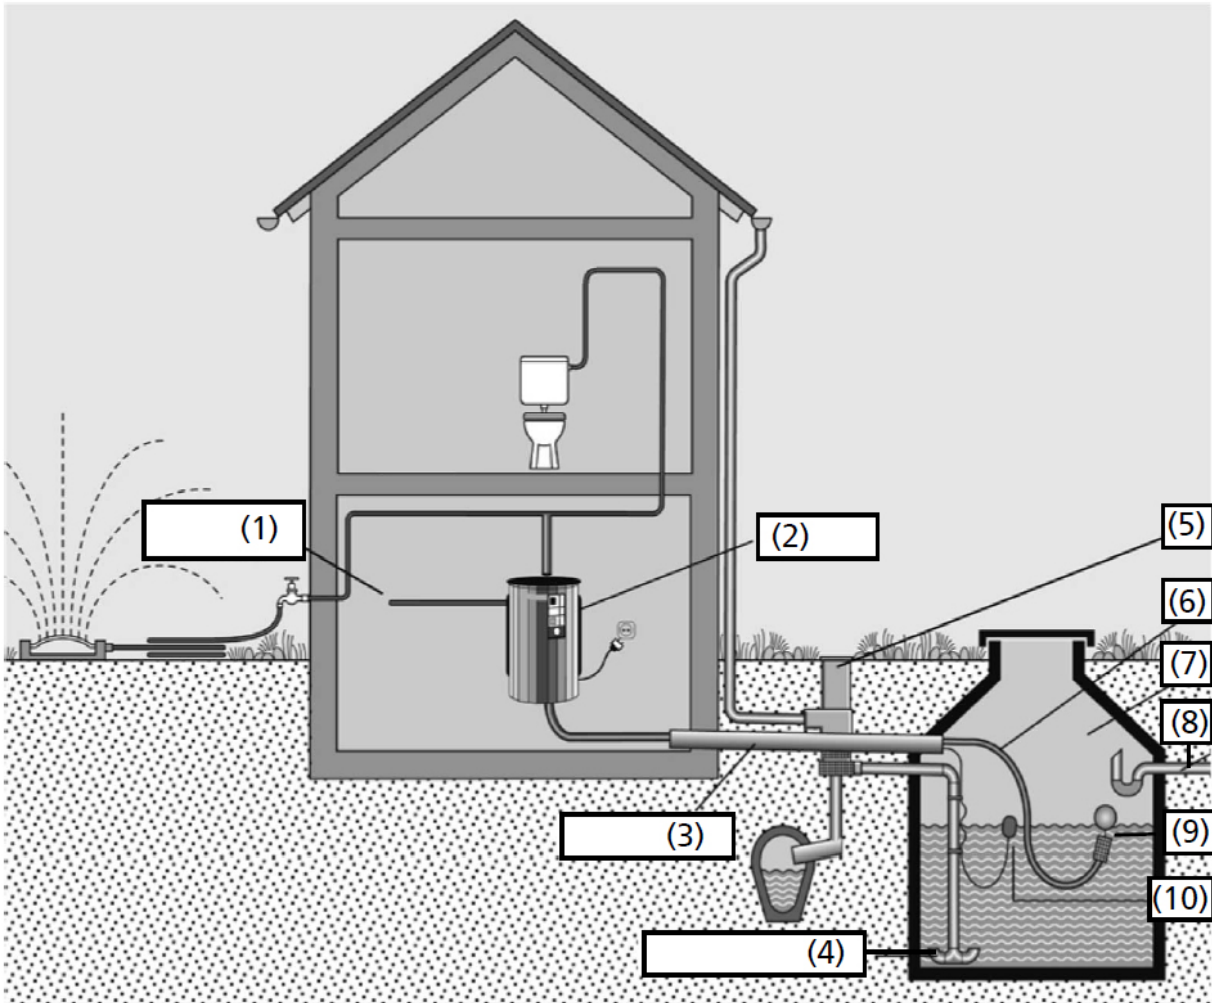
Example of installation with underground rainwater storage tank outside the building
